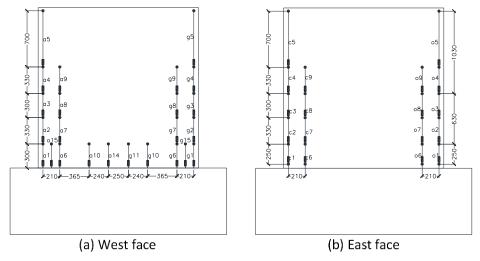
Instrumentation: Linear potentiometer provided on wall specimens
